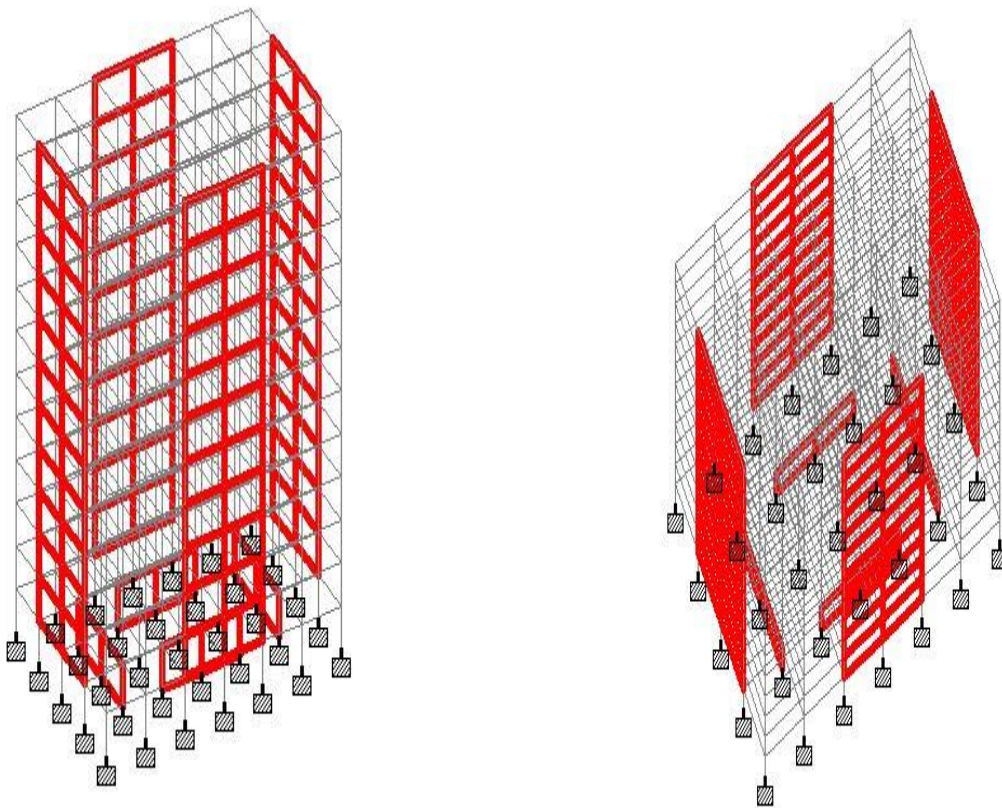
3D view of Out-of-Plane Offsets Discontinuity structure with Shear wall(12 storeys)
